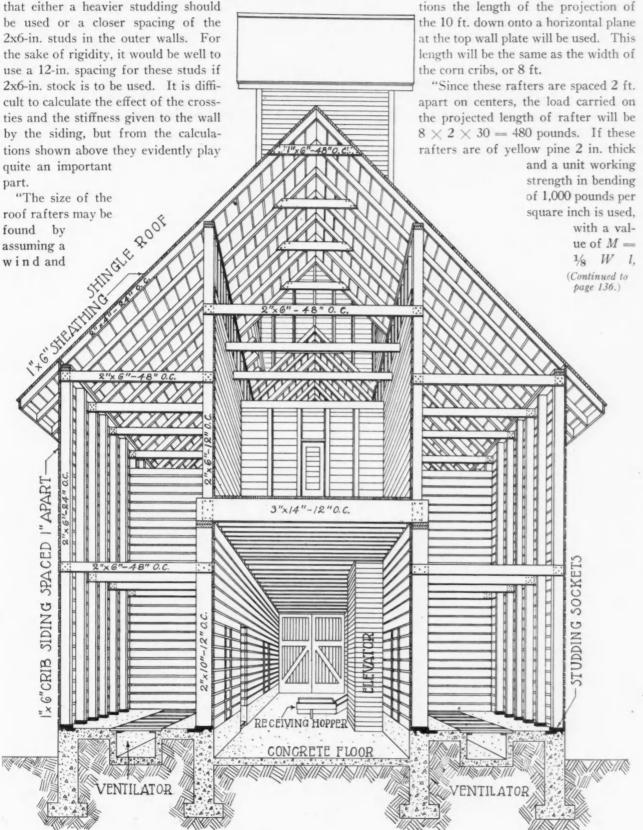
A. Section and Interior Perspective of Grain. Storage Building, Showing Details of Framing.
